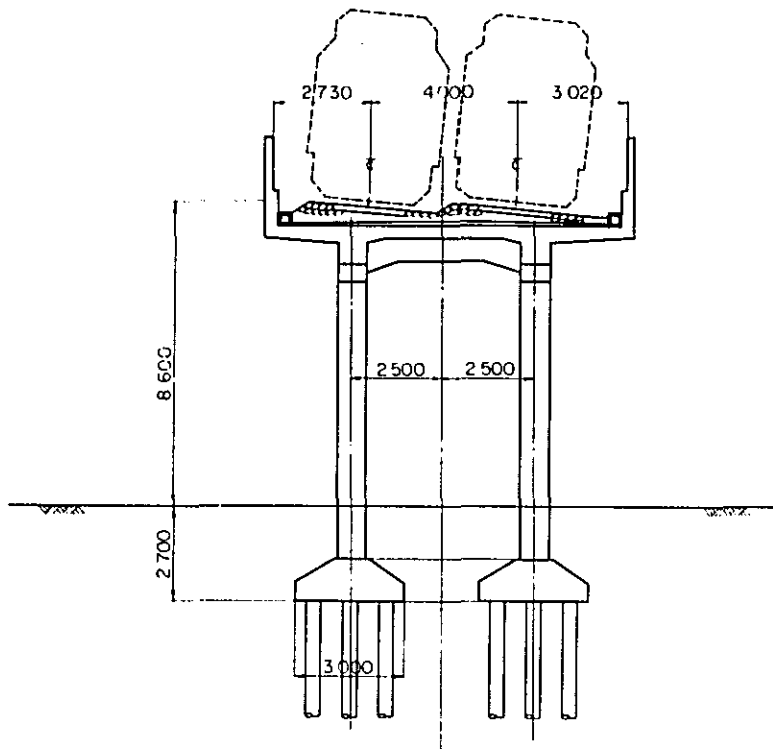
Standard Design of Rigid Frame Reinforced Concrete Elevated Bridge
